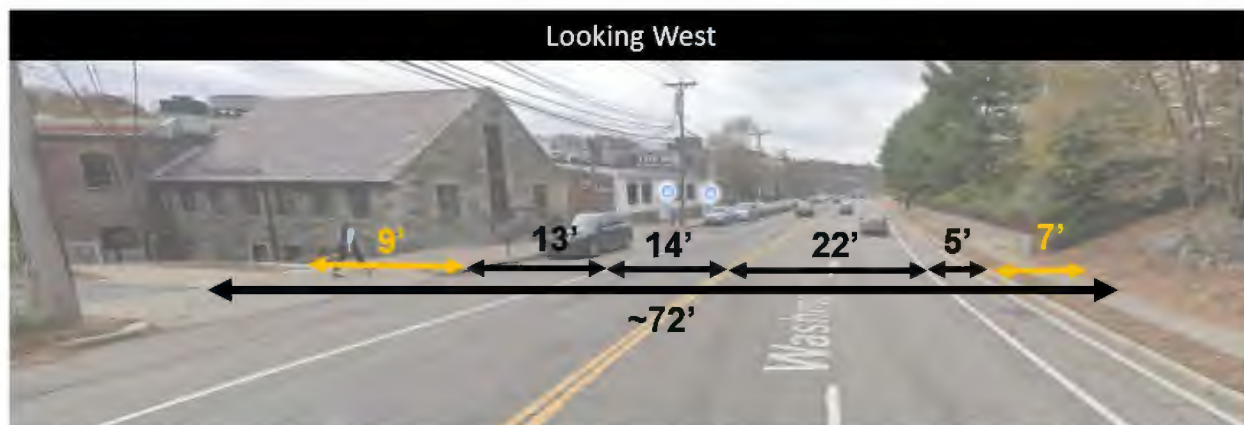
Existing Conditions – Washington Street Midblock Crossing at Cordingly Dam (Location 1)
